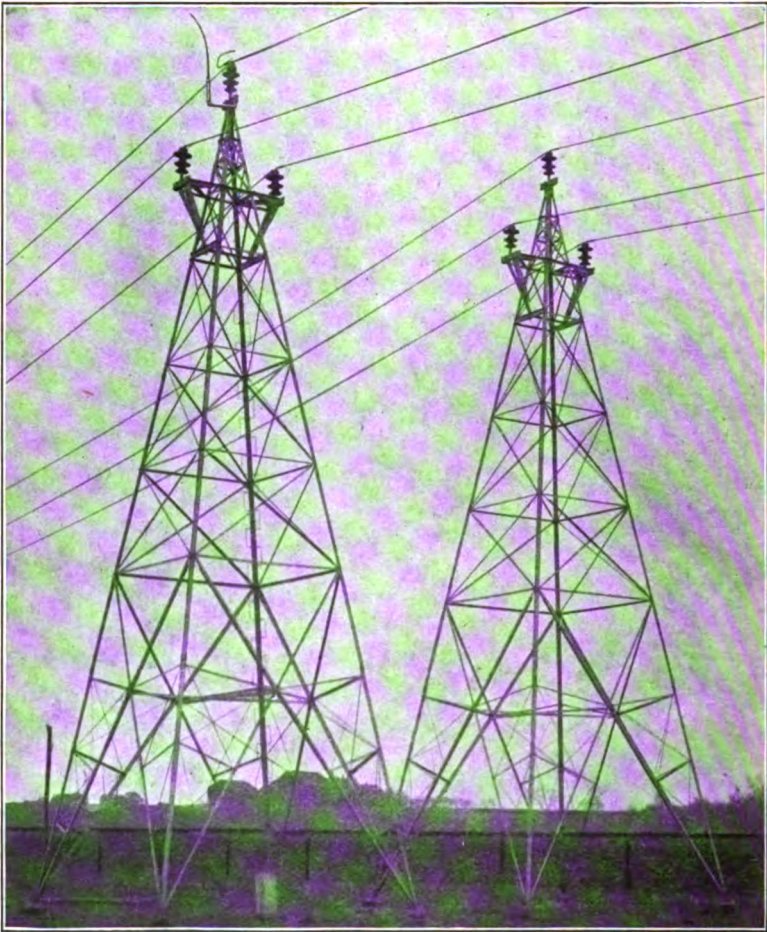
55-ft. structural steel towers, showing a relief gap, as used in 1907
